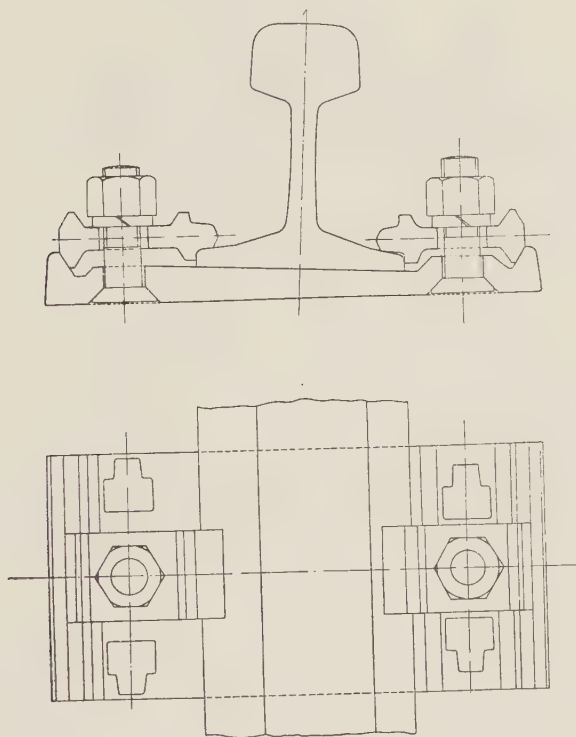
Use of metal bearing plate with indirect fastening to wood sleeper — Czechoslovakia.
